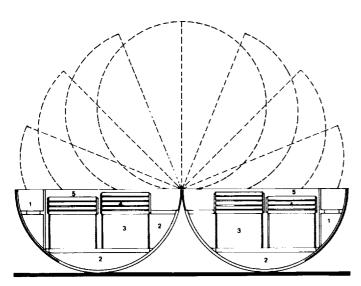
Hinge-connected cylinder halves. Cross section showing folded structures. (Legend: 1. Ground regolith pumped between two layers of pneumatic structures and flowing to shield module sides. 2. Infrastructure and utility space. 3. Rigid floor and fixed installations. 4. Foldable structural units and room enclosures. 5. Pneumatic structures or capsule shells.)
